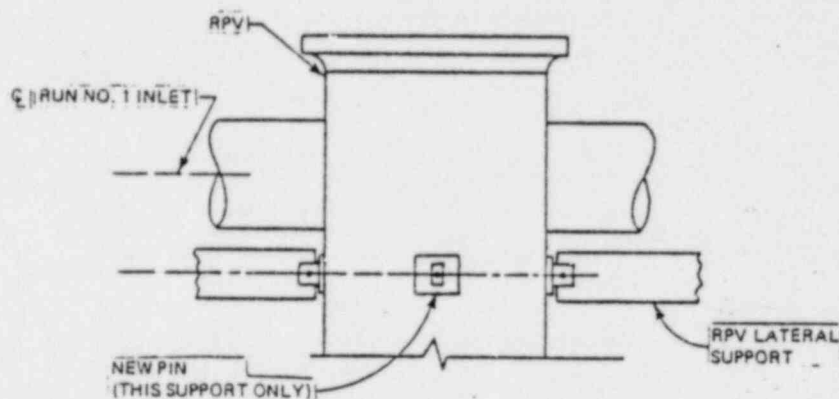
ELEVATION VIEW OF TOP OF RPV
